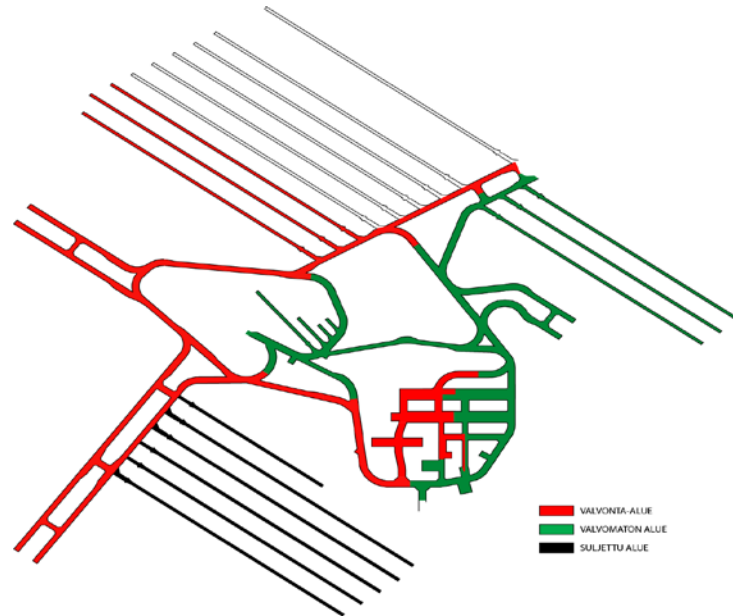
Deposition tunnels and central tunnels in underground facility.
